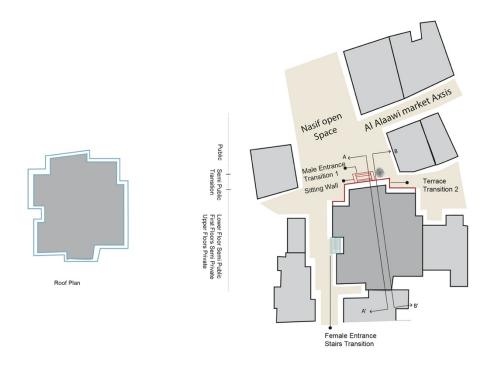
Indicating the visible thresholds in plan and their relationship to the street and surrounding buildings. Source: Author.
